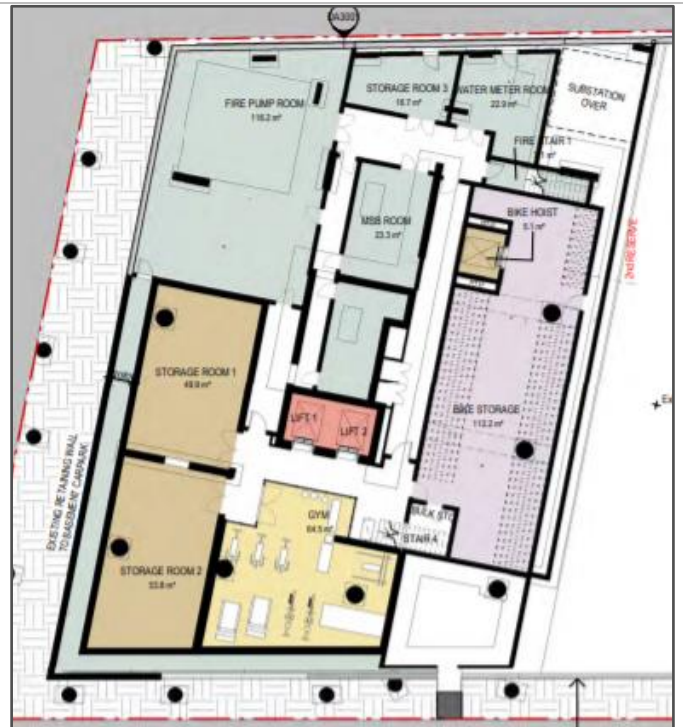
| Approved basement plan under SSD 9194 MOD 3. (Source: approved architectural plans).
